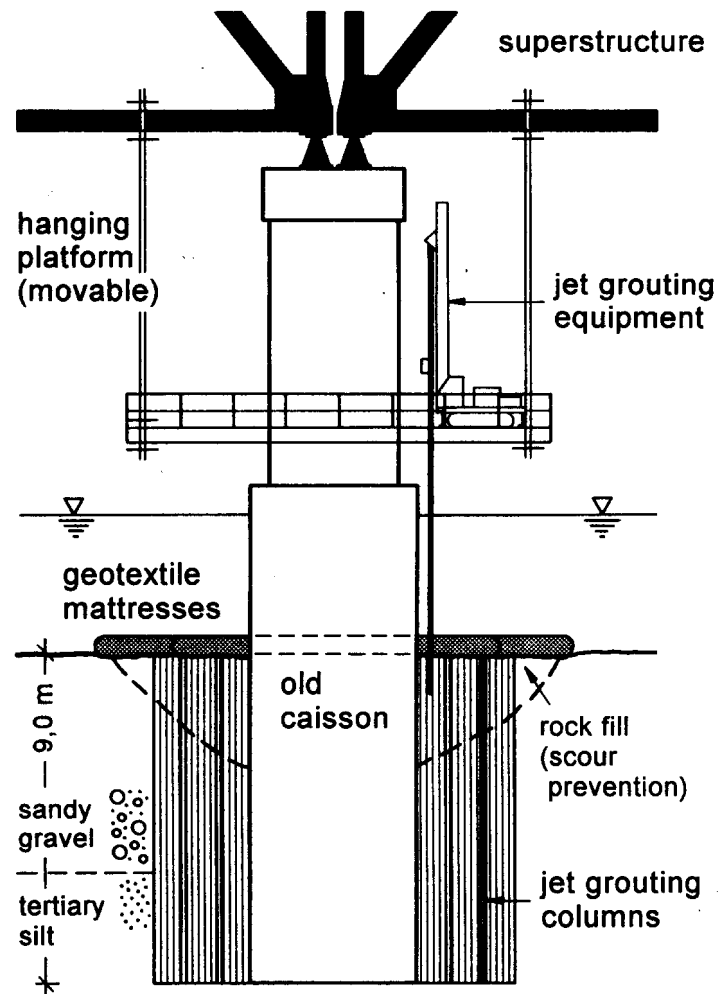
Foundation strengthening of an old river bridge pier by a box-like enclosure with jet grouting columns. Cross section (schematic). River bed covering with geotextile mattresses for high pressure grouting from a platform hanging on the superstructure
